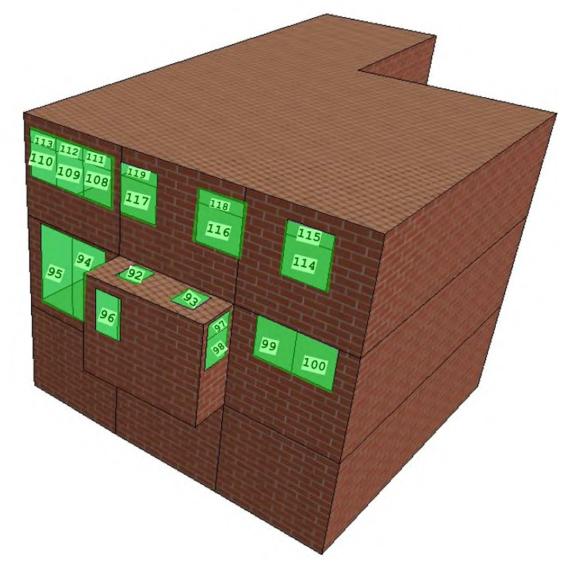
Window Maps of 32A Daleham Gardens (West Elevation)
